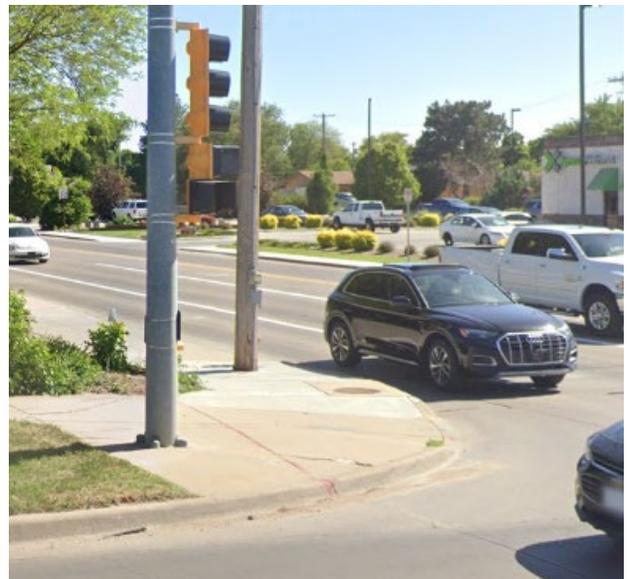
Curb ramp missing truncated domes and sidewalk obstruction
